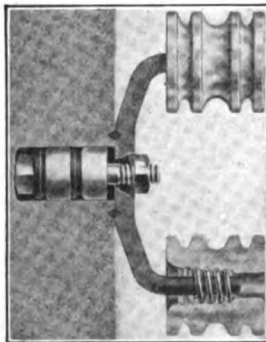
TWO-UNIT PLAIN CINCH ANCHOR INSTALLED
